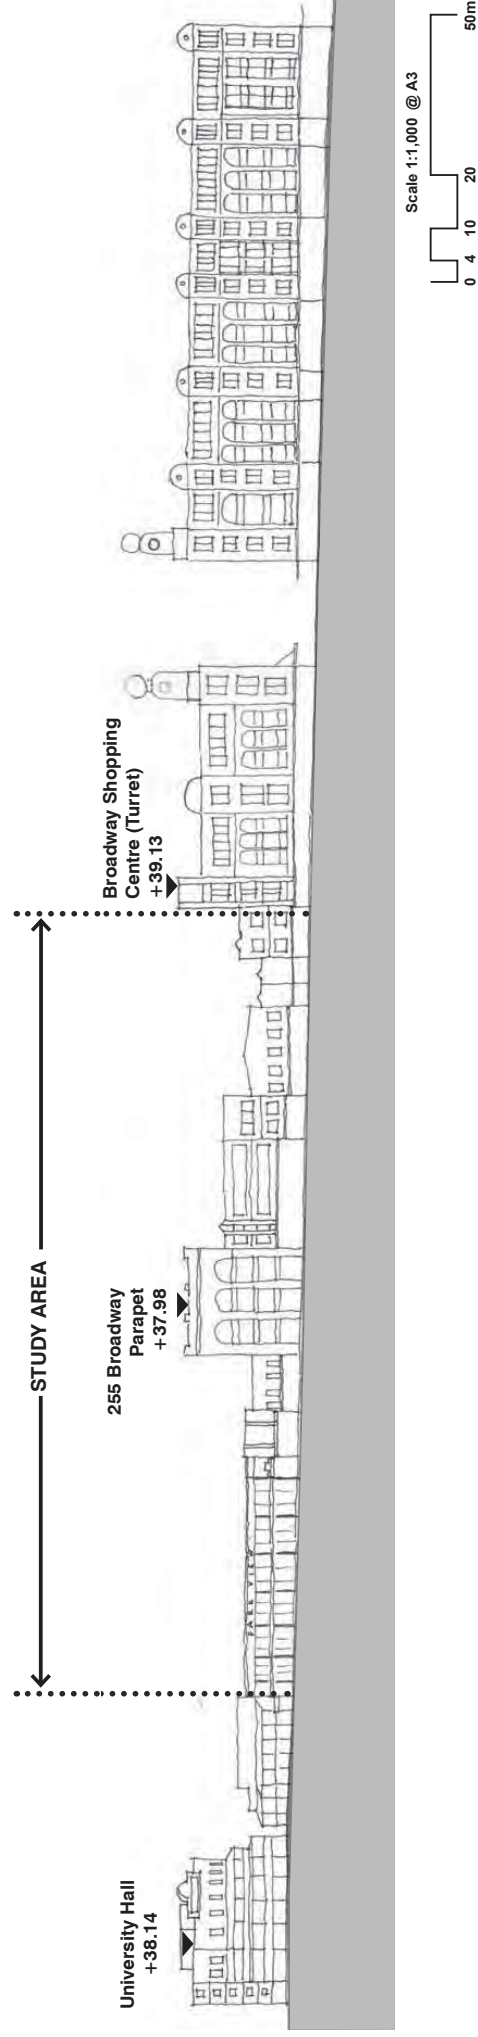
Architectus, Broadway Review of Planning Controls pg. 9, Existing East Elevation - Broadway
